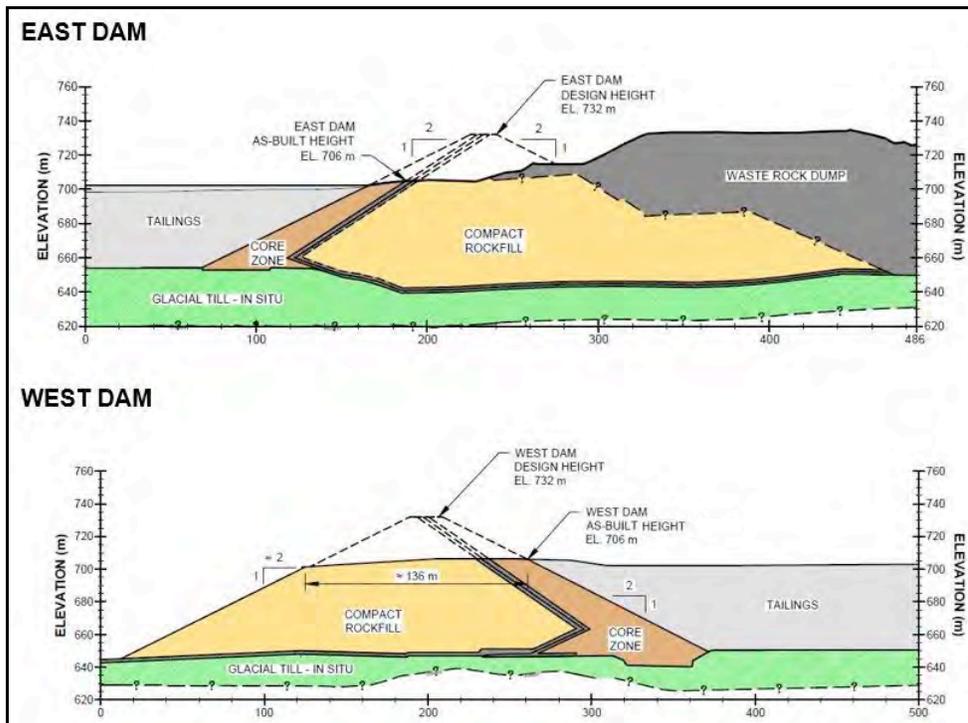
Typical West and East Dam Sections for the Historical Tailings Impoundment
